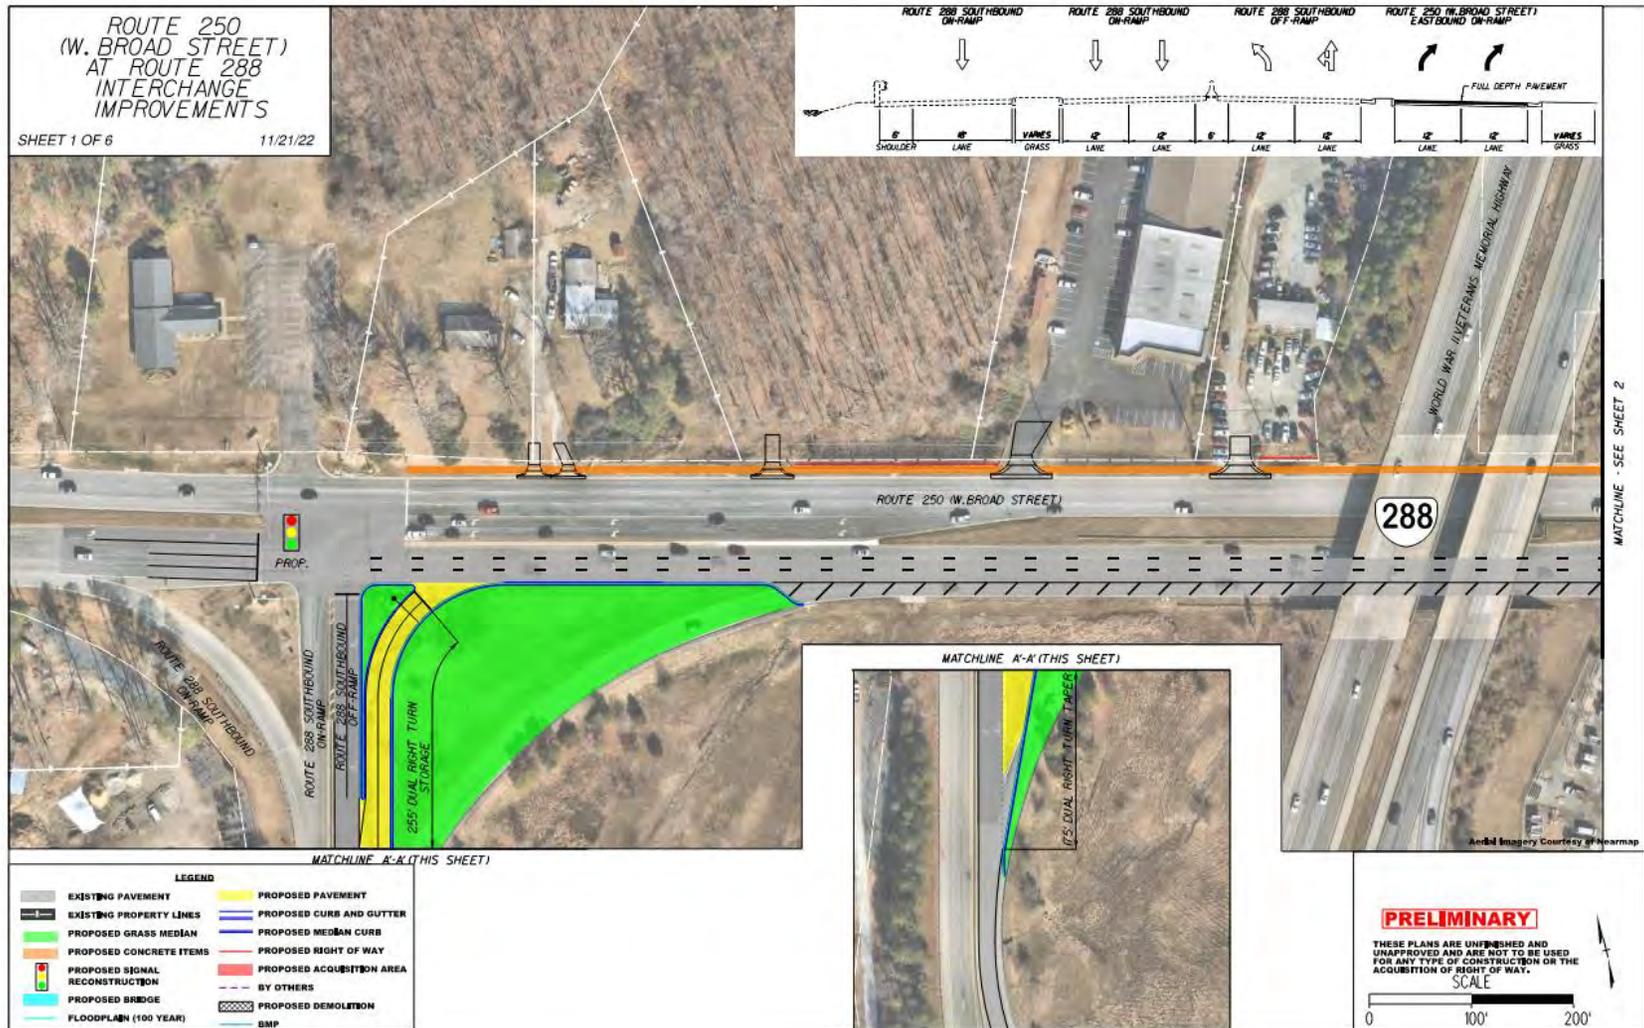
Route 288 at US 250 Ramp and Ramp Terminal Improvements (2)
